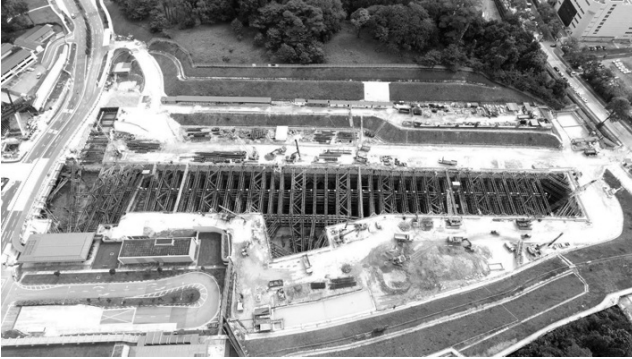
Bird-eye view of cut and cover tunnel excavation
